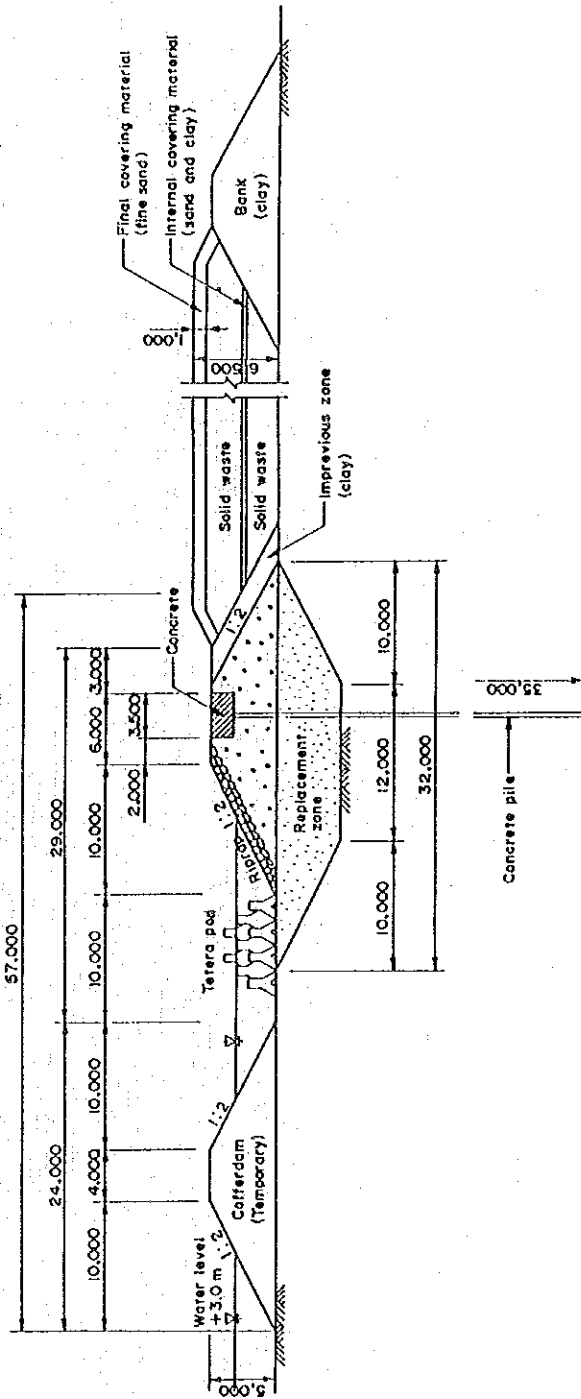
Outline and Standard Section of Seashore Site
